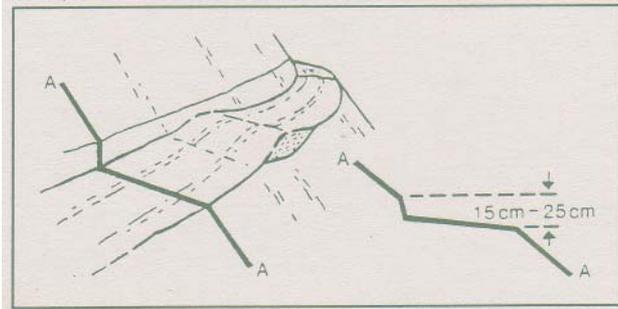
Outfall surfacing of the road should be used instead of infalling.
